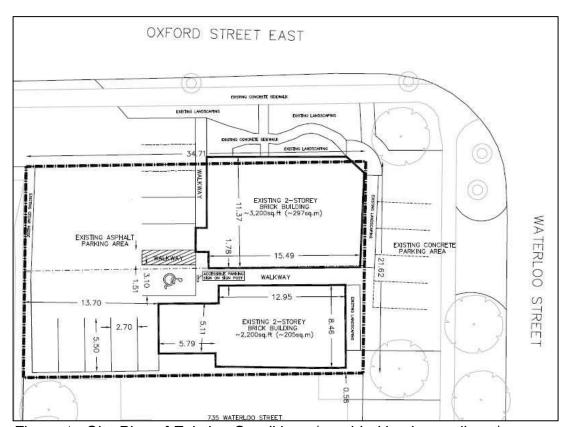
Site Plan of Existing Conditions (provided by the applicant)
